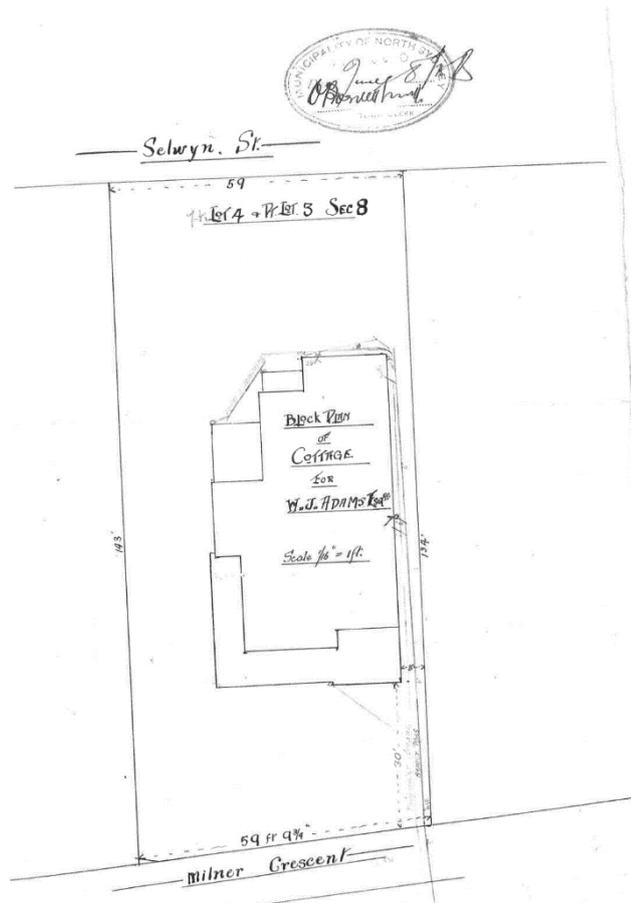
Block plan of the cottage constructed on the subject site for W J Adams, June 1915 (Source: Heritage Centre, Stanton Library, North Sydney)
